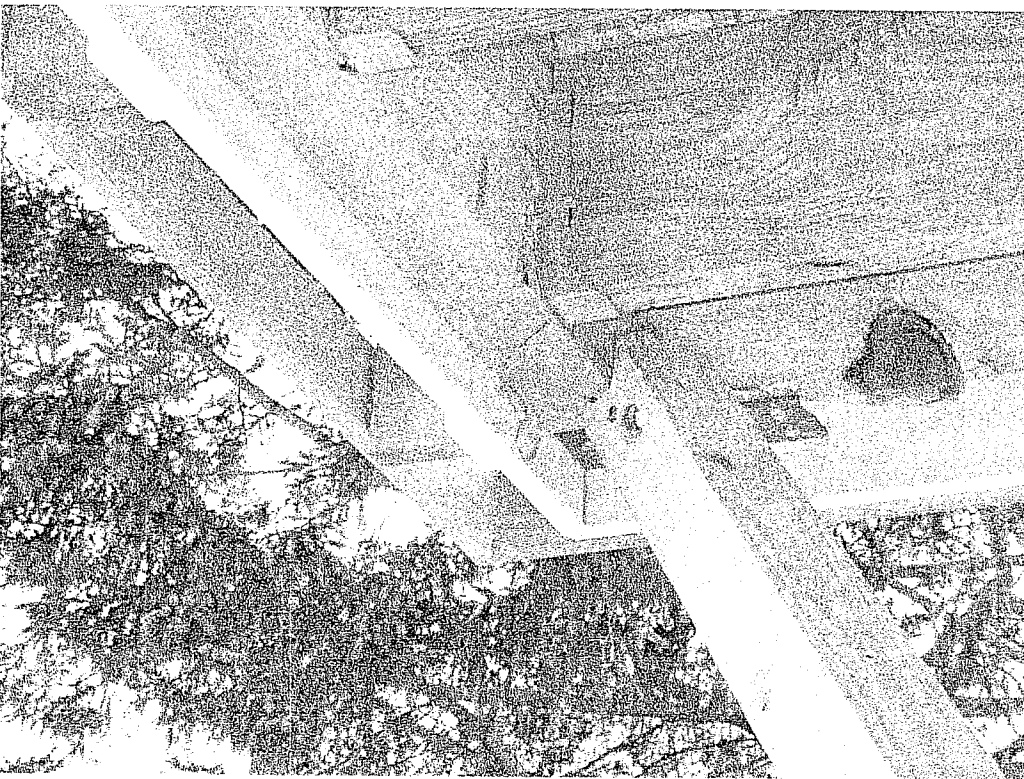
Top of diagonal brace (2nd bolt not yet installed)
